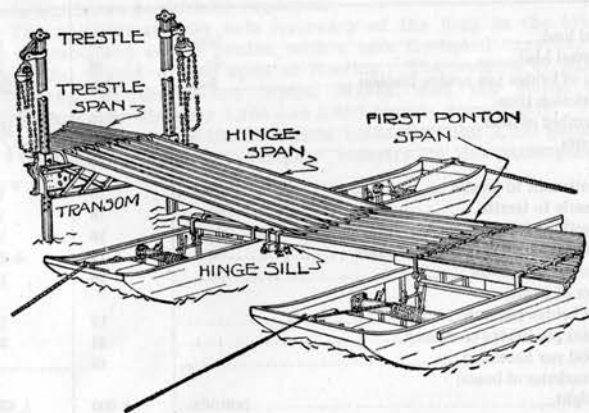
Hinge sill raft and trestle (23-ton M1924 bridge).
